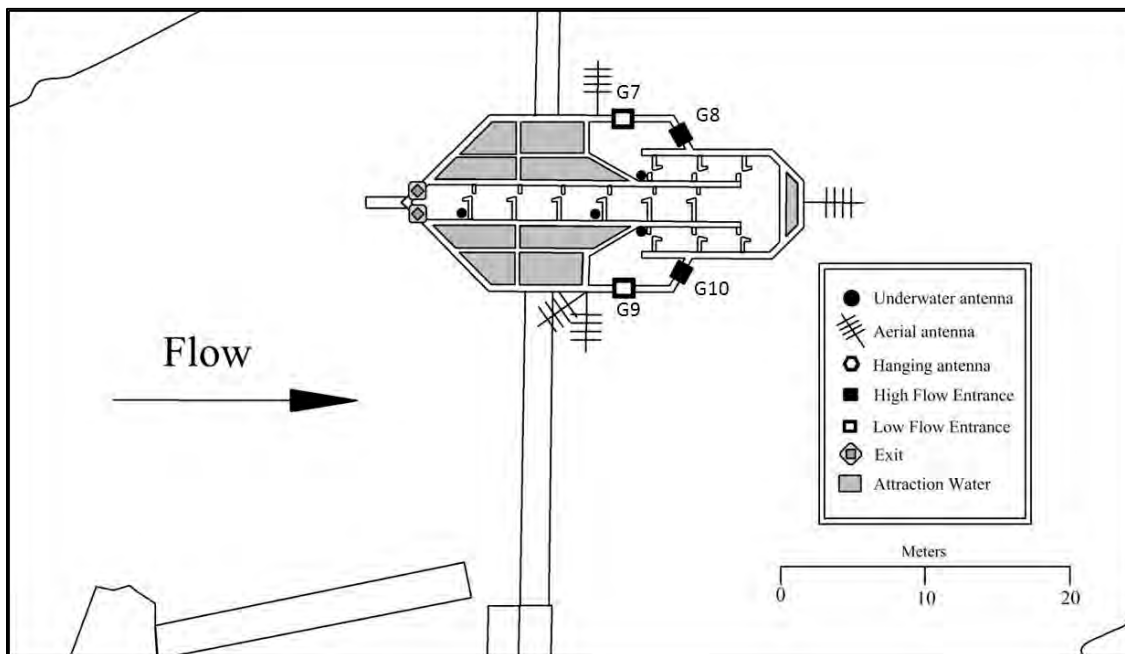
Wapato Dam west branch fishway entrance gate labels.
